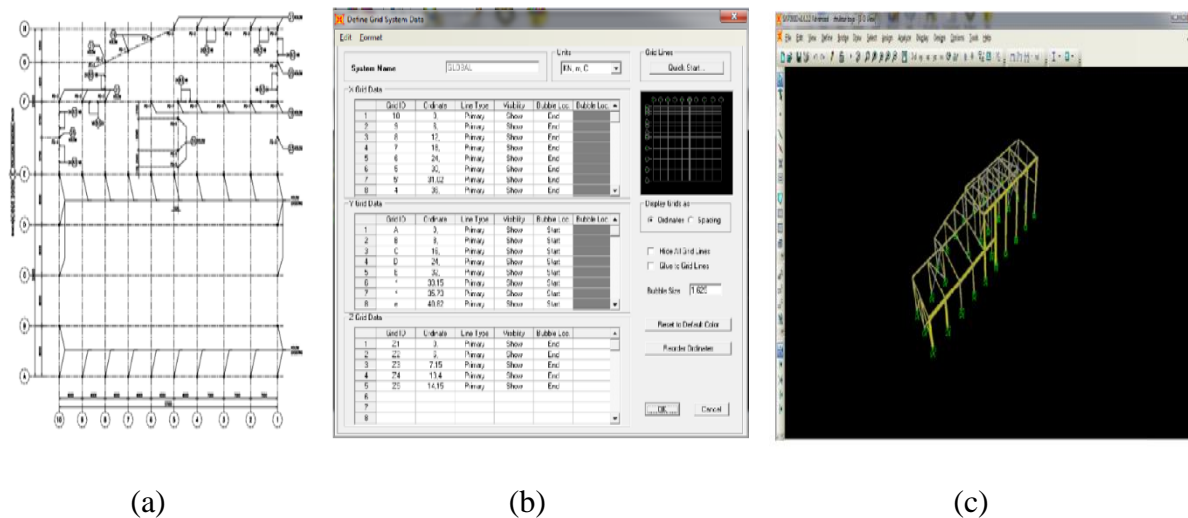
Boiler Warehouse construction design simulation using SAP software consists of: (a) Building plans, (b) Grid and ordinate, and (c) 3-dimensional structural modeling
